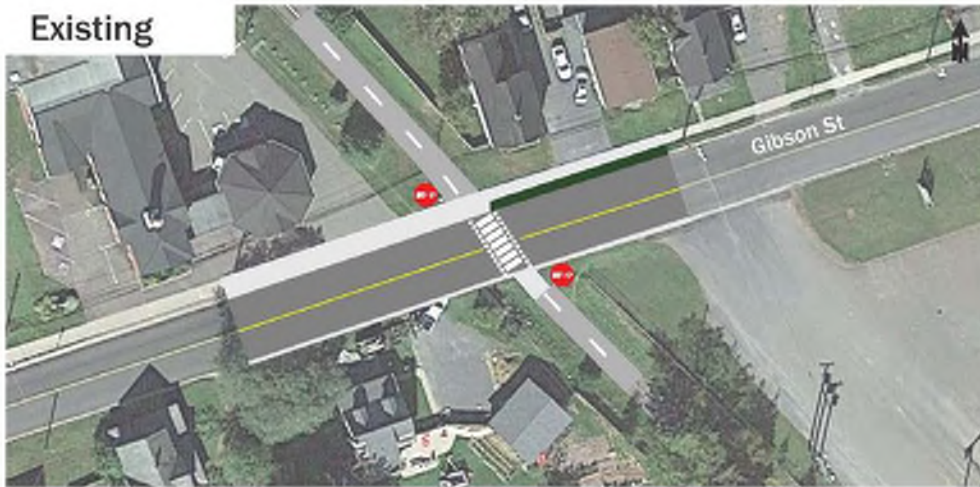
and 9 provides a sample illustration of the existing signage and pavement marking treatment at the mid-block crossing of the Northside Trail at Gibson Street (north of Devon Avenue). Zebra strips are used to delineate a pedestrian crossing space with elephants feet denoting where cyclists can cross. Stop signs are installed for the trail users where the trail meets the sidewalk. Trail Crossing Warning Signage is currently present for this crossing (as shown in Figure 8).
